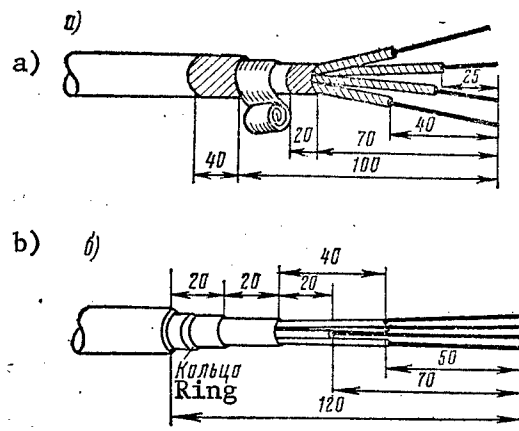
The dimensions for stripping KSPP-1x4x1.2 cable:
